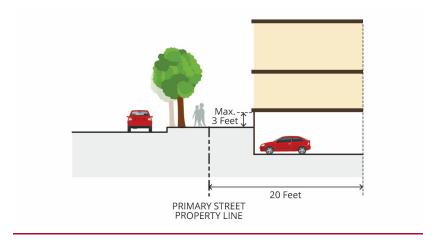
H UNDERGROUND AND TUCK UNDER PARKING, MAXIMUM ABOVE
